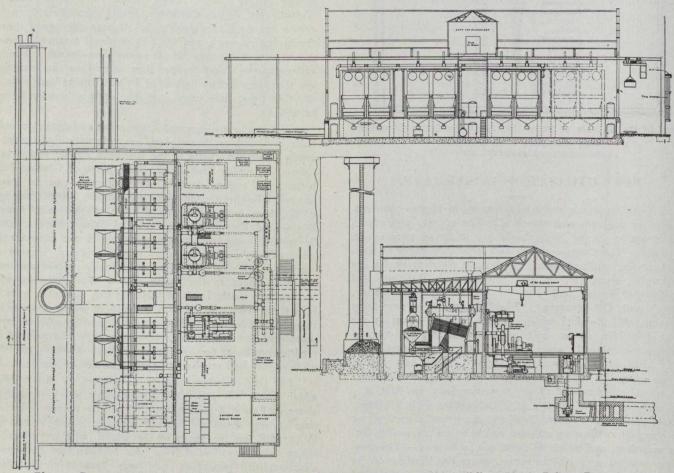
Power Station for Prince Rupert Dry-Dock Ship-Repair and Shipbuilding Plant, Prince Rupert, B.C.
